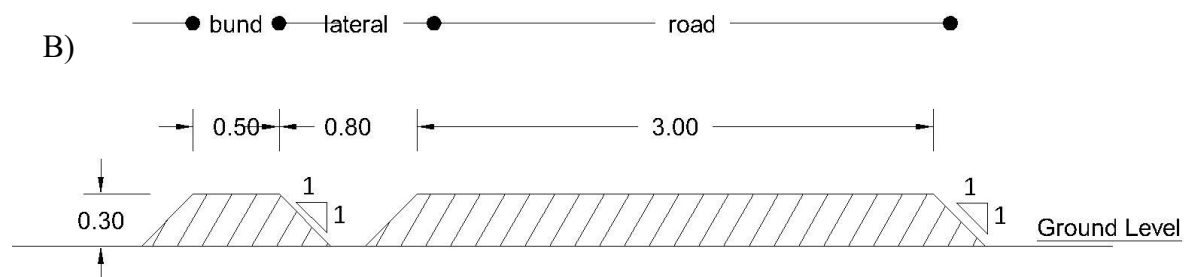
Cross-Sections of Lateral Embankment: With Road.
